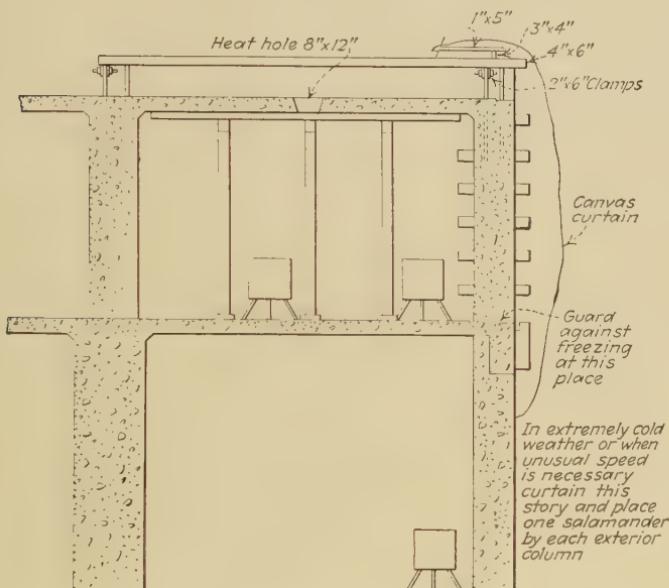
Detail of wall curtain and floor covering arrangement.
